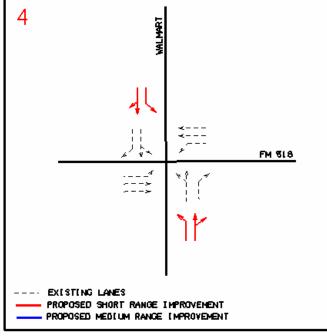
Wal-Mart Driveway Recommendation
